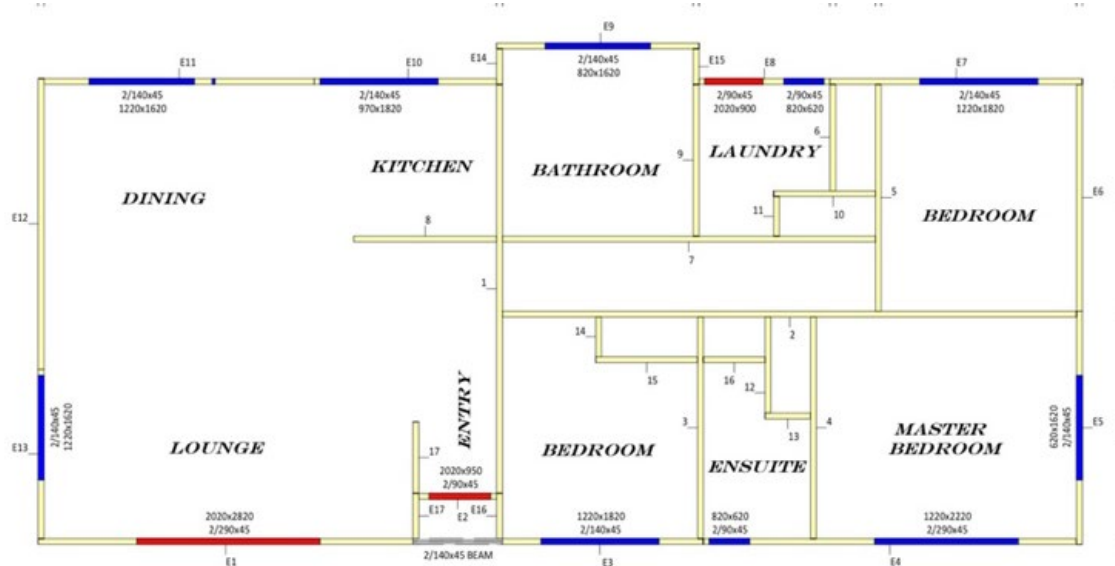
Simplified house plan design for use in detailing analysis (modified from original)
